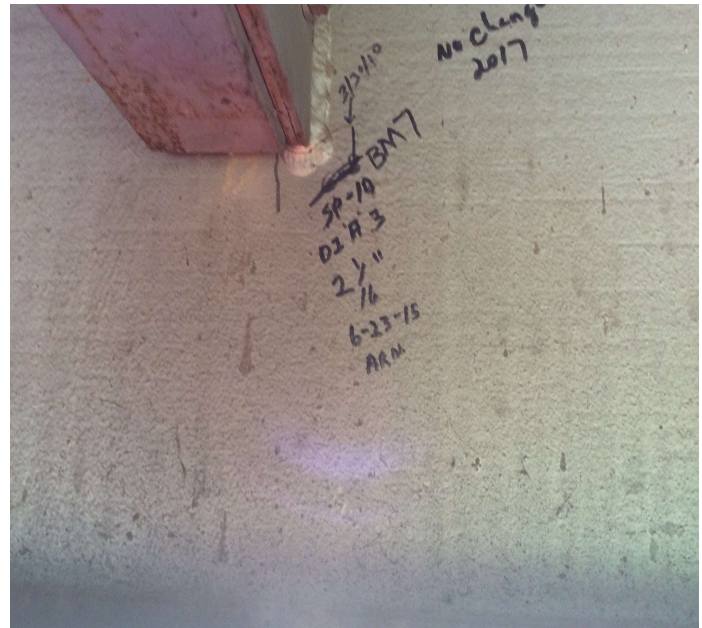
Description Span 10 girder 7 diaphragm 3 crack in web. No change since last inspection.
